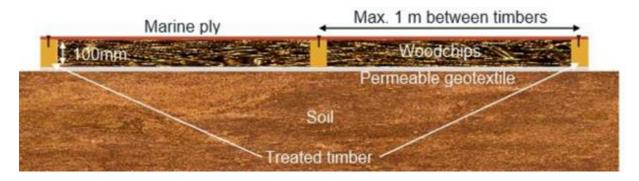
Plywood sheeting supported by timber bearers with woodchip infill used as ground protection for parts of the RPA outside fencing.
